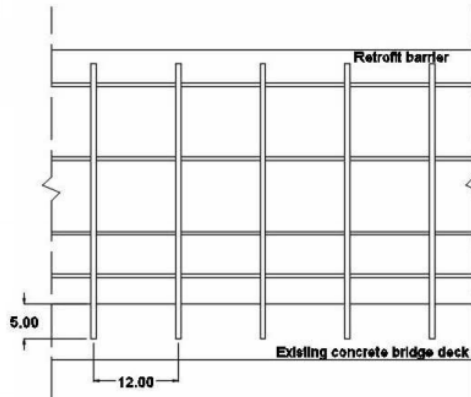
Elevation view of retrofit barrier interior region (units of in.)
